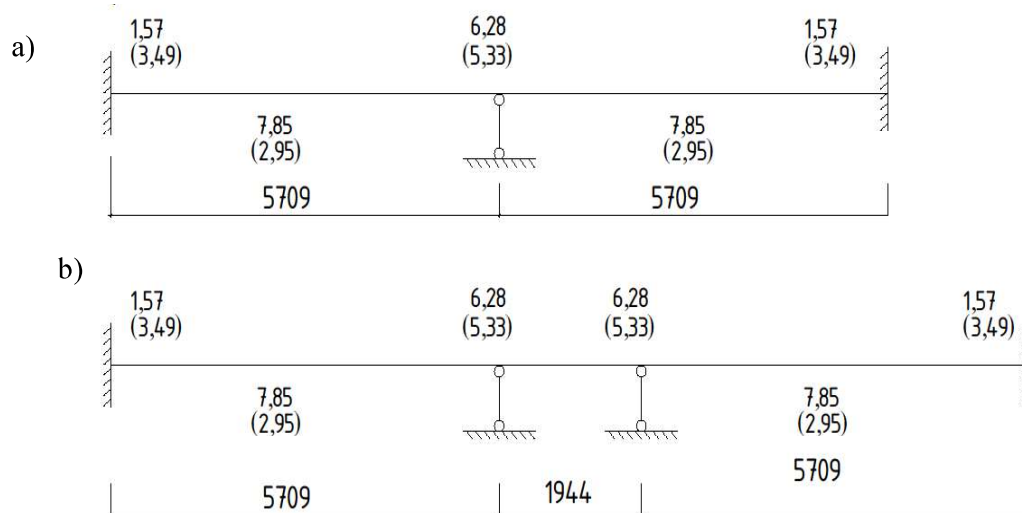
shows a comparison of the required reinforcement of the beam cross-sections obtained by calculation with the existing reinforcement.
